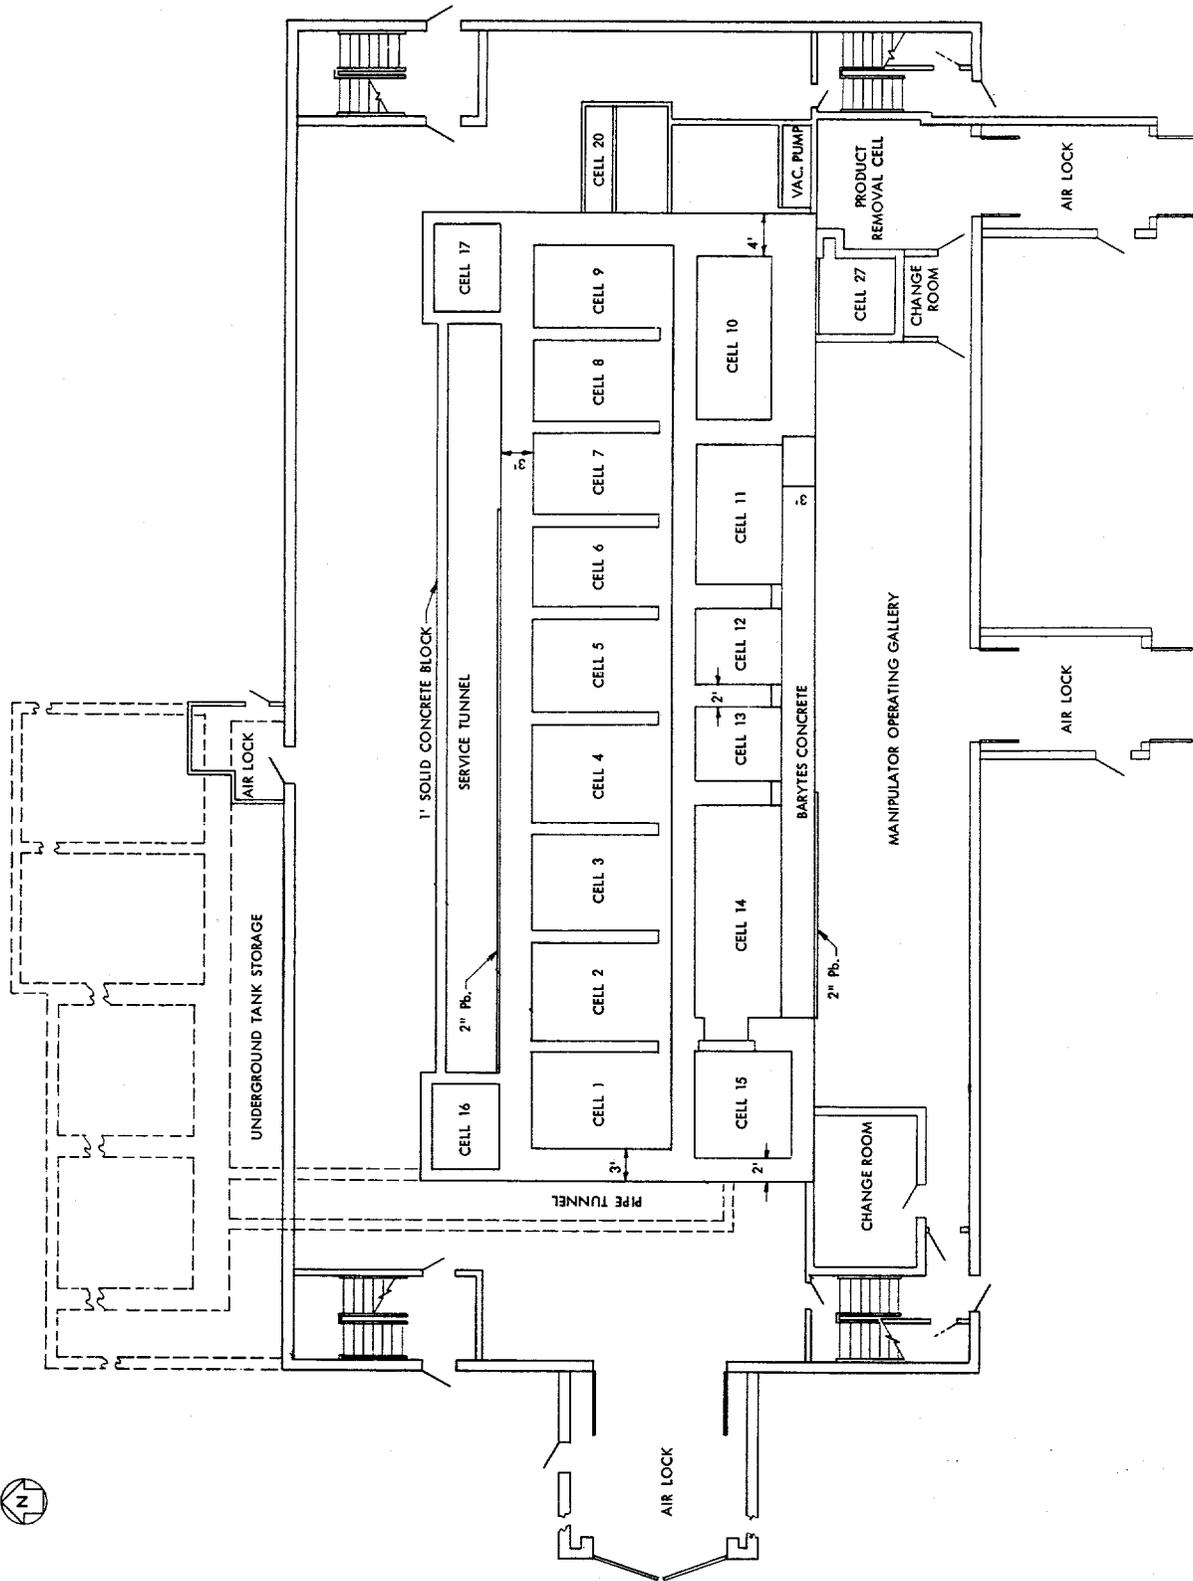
BLDG. 3517 FIRST FLOOR PLAN
